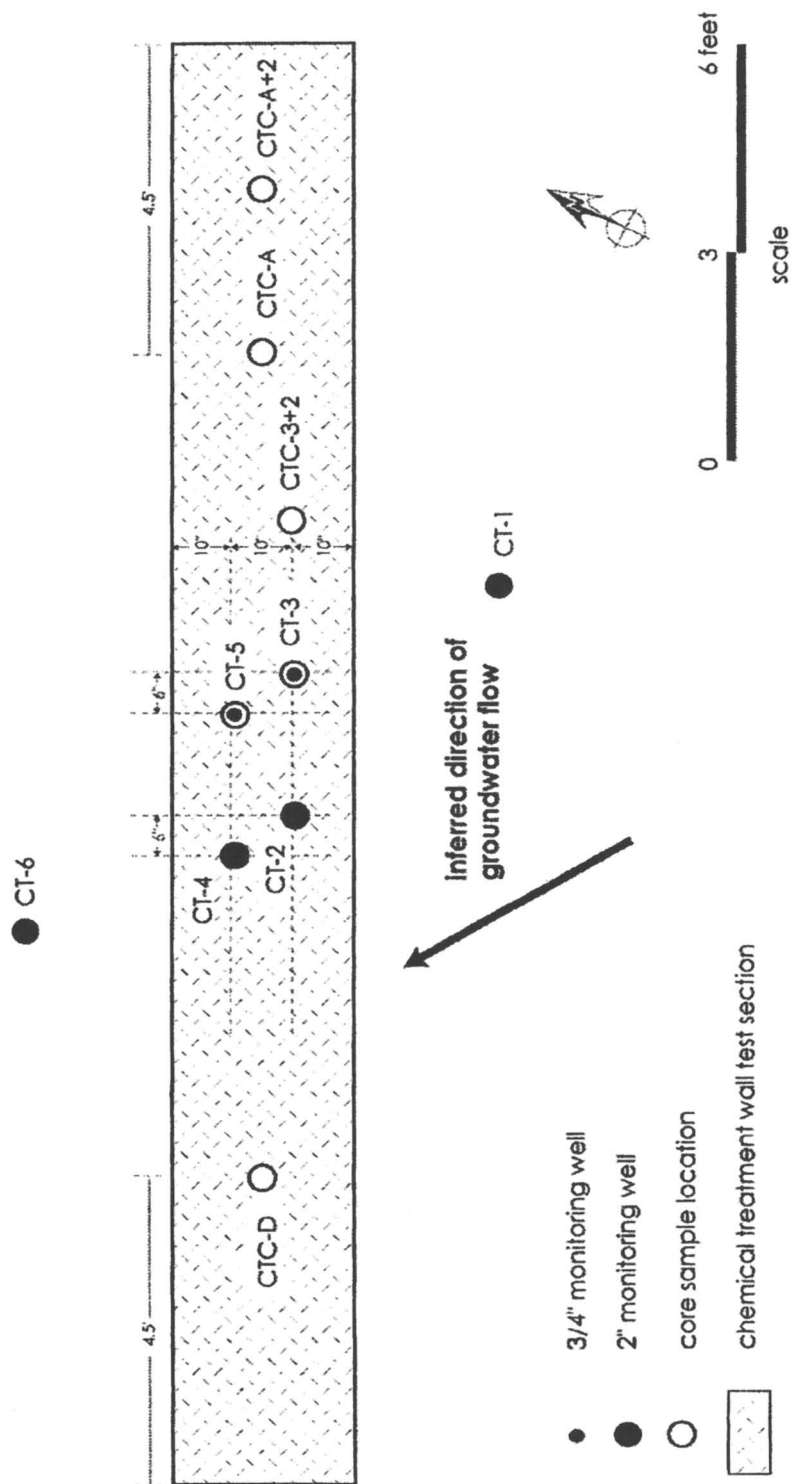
Locations of core samples and monitoring wells in the pilot-scale PRB test section at the Somersworth, NH Landfill Superfund Site.
